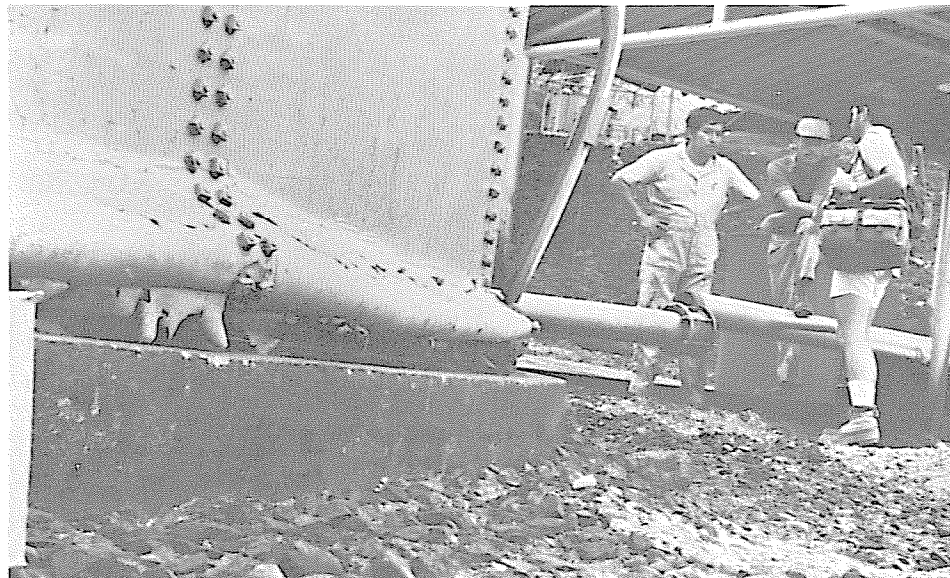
Circumferential buckling and pipe pullout of water tank at Salado Pump Station.
